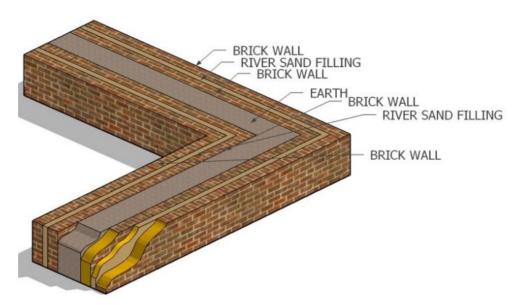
Parallel Wall Construction and River Sand as Insulation.
